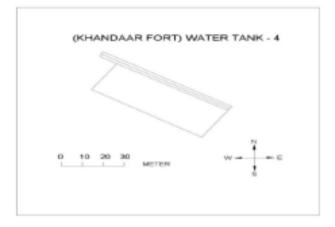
Plan of water tank no. 4 Khandar fort.
